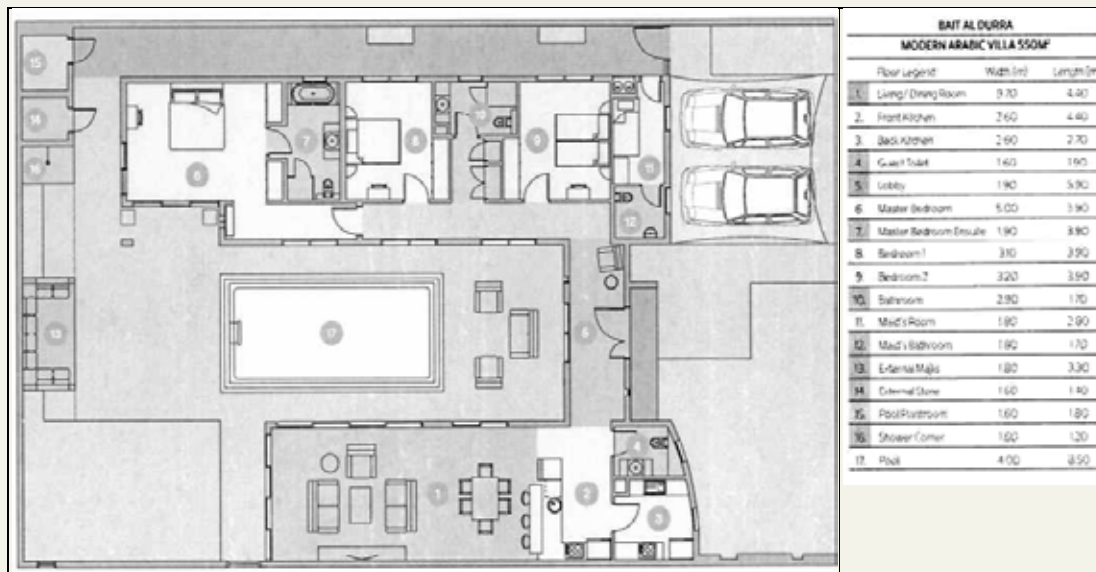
Example of Villa Floor Plan (DAB, 2009)
